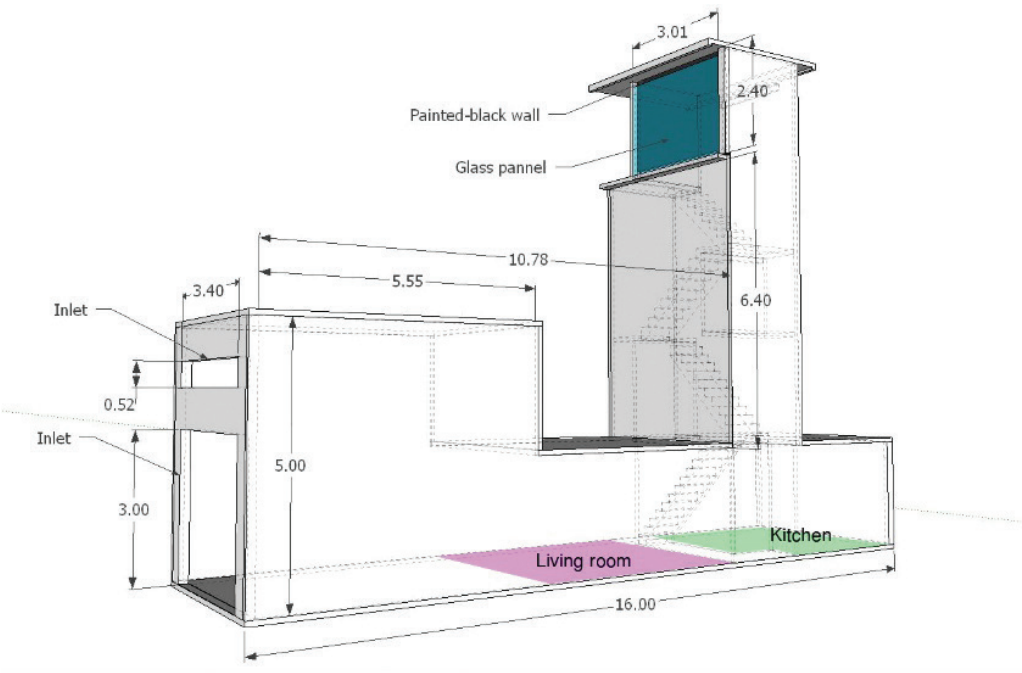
, 3D modeling showing the location of Trombe wall (m.)
